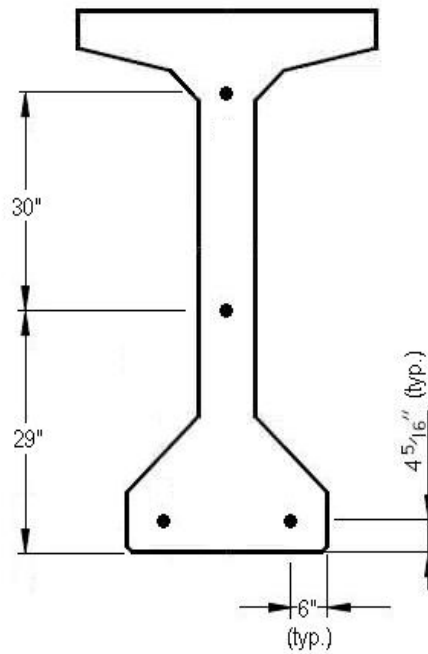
Location of the embedded VWSG on the 82-foot girder.
